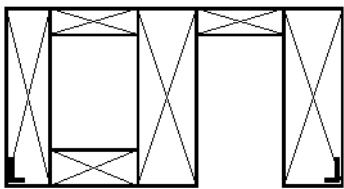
Testing apparatus for AC269.1 Section 4.2, E564 tests
